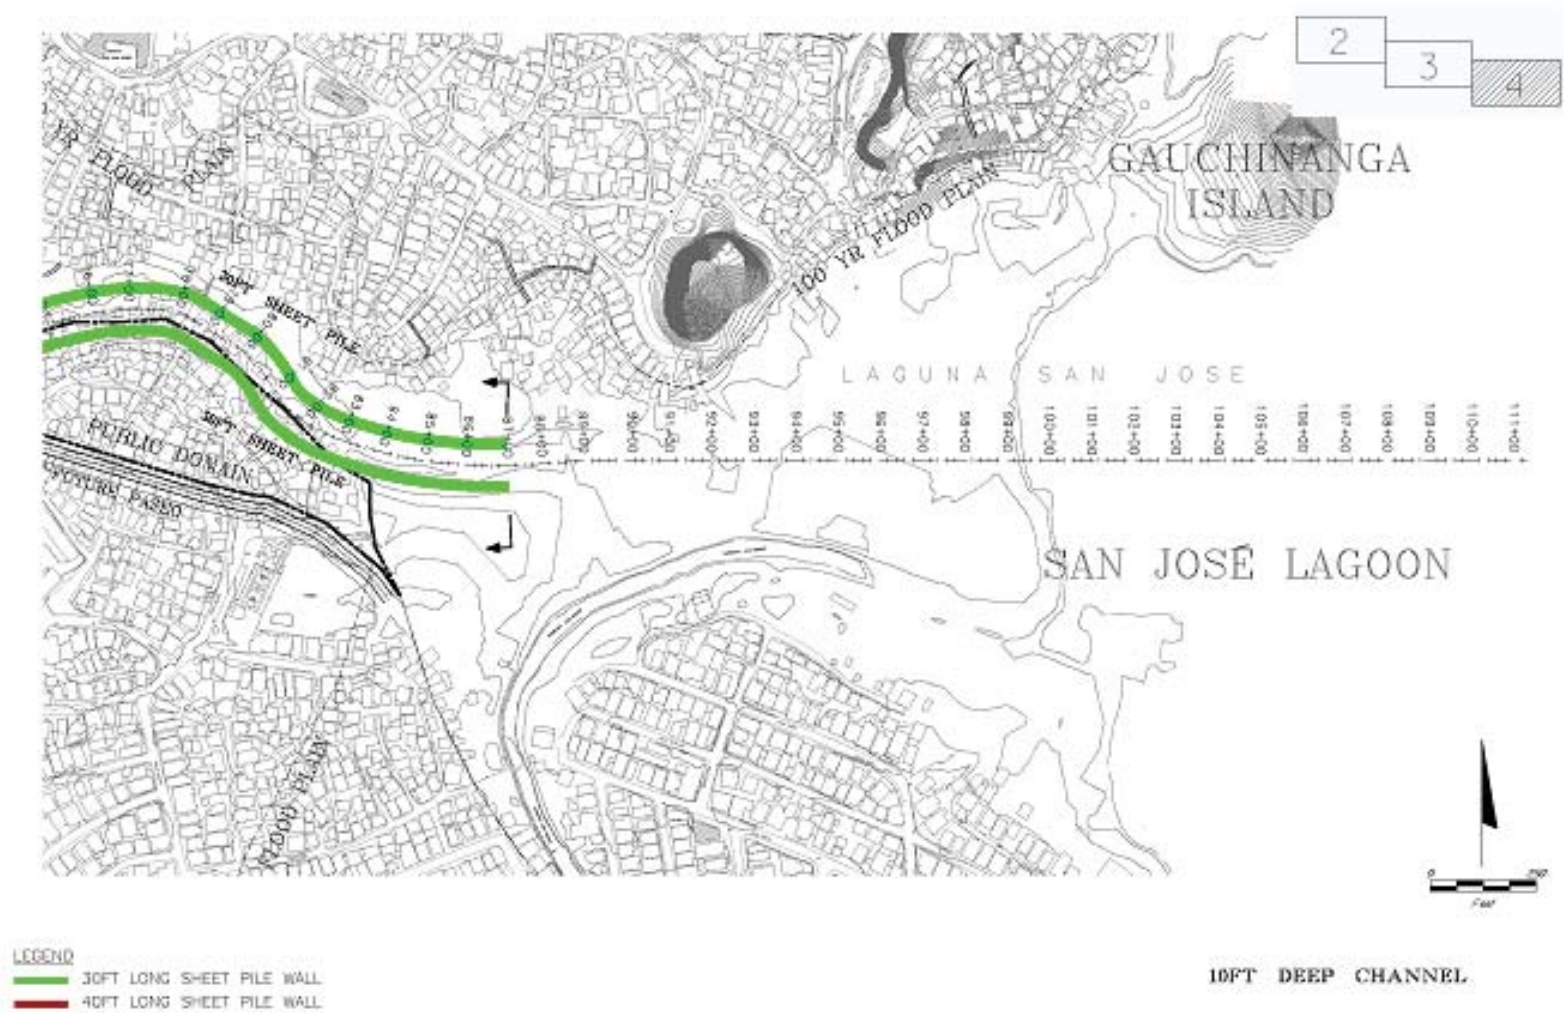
Sheet Pile Wall Layout, 10-foot-deep Channel
